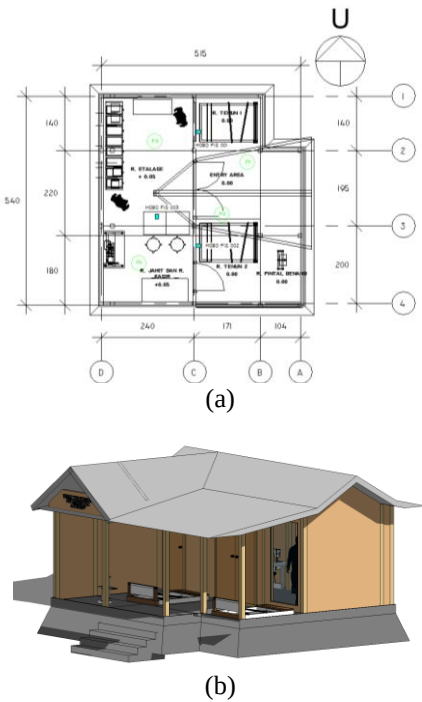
Fetung Bayan* (a) Floor Plan, (b) 3D Building Visualization
